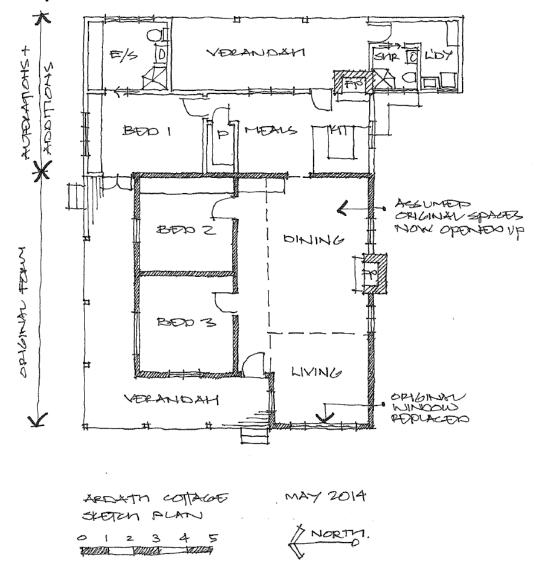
Sketch plan of Ardath Cottage. (Source: David Hobbes of Philip Leeson Architects, May 2014)
